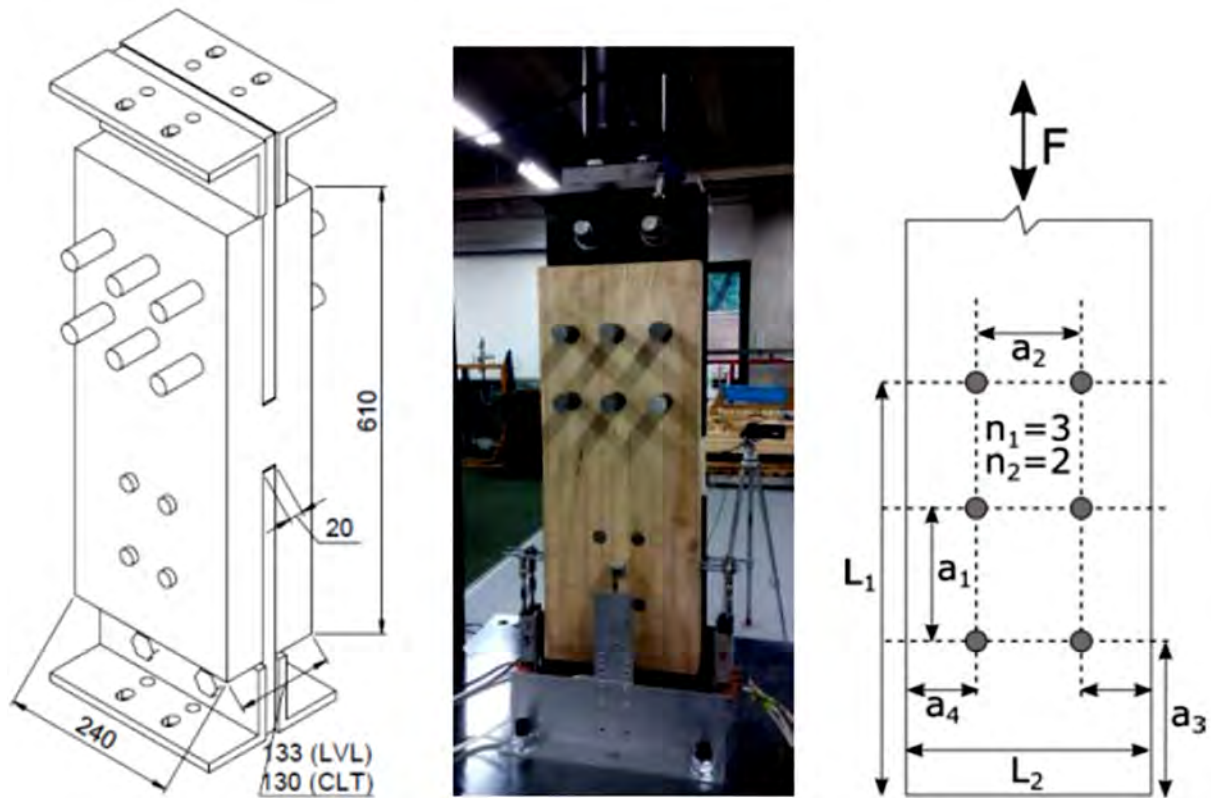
Set-up for connection tests and specimens dimensions[37]
